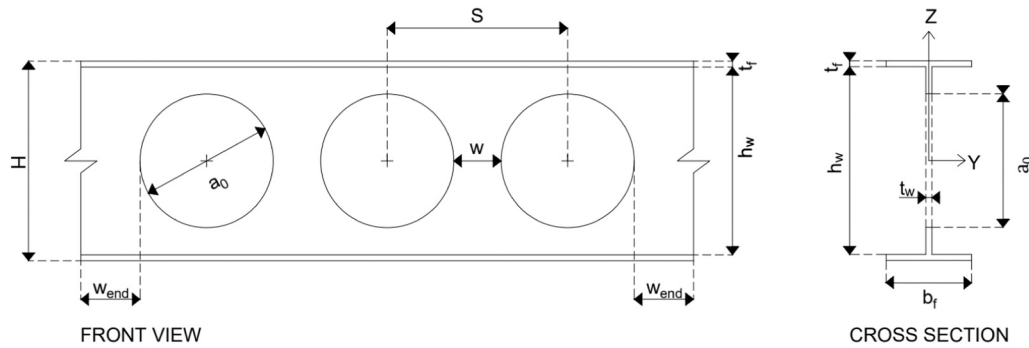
Geometric dimensions of the cellular beam in front view and cross-section.
